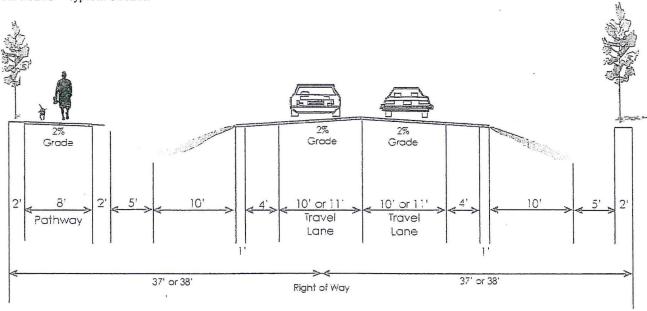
is the typical section for a rural collector. For local secondary roads, a typical section would have a 50-foot right-of-way and would include 20- to 24-foot surface widths (10- to 12-foot travel lanes), depending on average daily traffic (see Table 4.5). These local roads would include 2- to 4-foot shoulders, wide enough to accommodate pedestrians.
